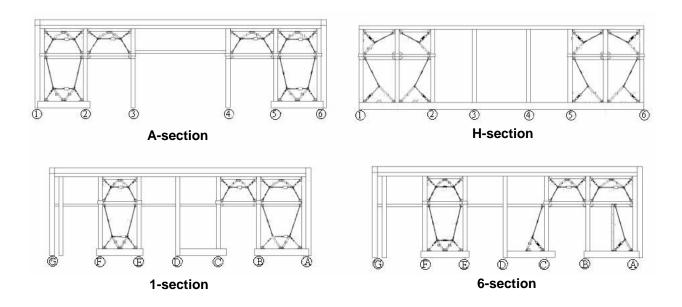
Sectional drawings of the frames installed in the tensile toggle damper systems
